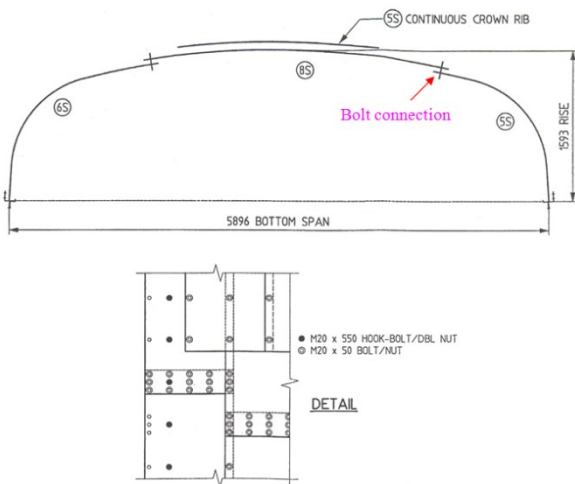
The cross-section of steel plates and connection details of the culvert 2G
